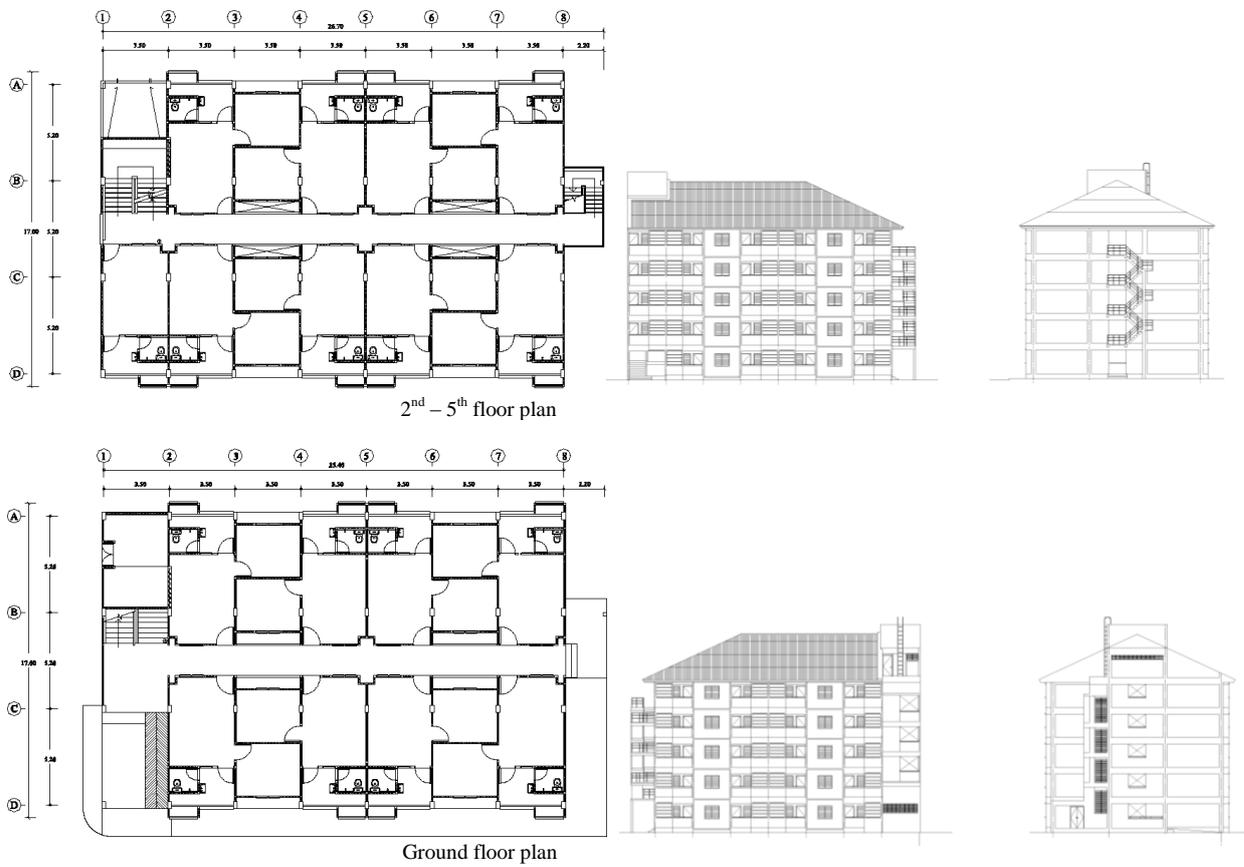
Floor plan and elevation of Buengkum Baan Eur Arthron Project
